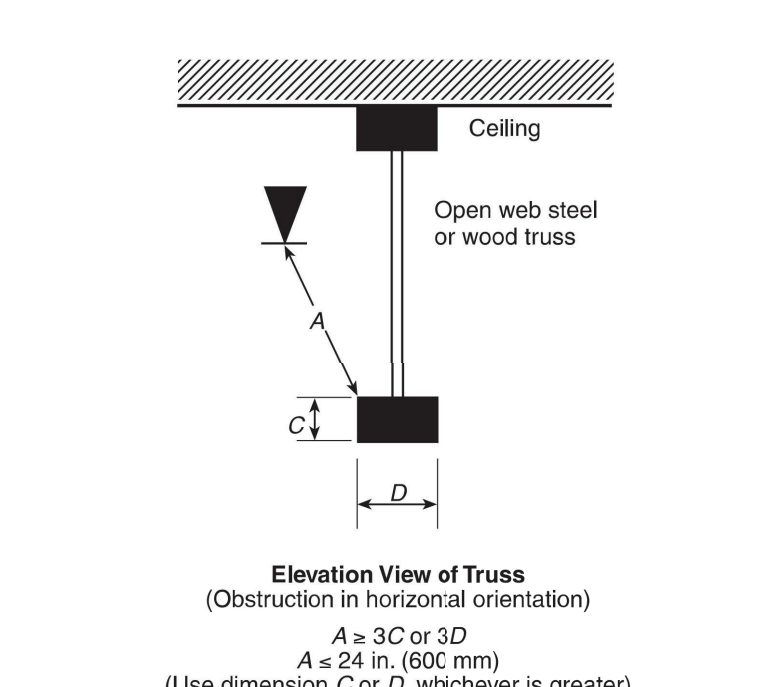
(a) Positioning of Sprinkler to Avoid Obstruction to Discharge (SSU/SSP).
